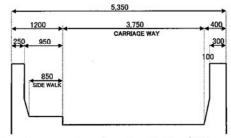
Typical cross section of one-lane bridge (Adjusted to NB load)
